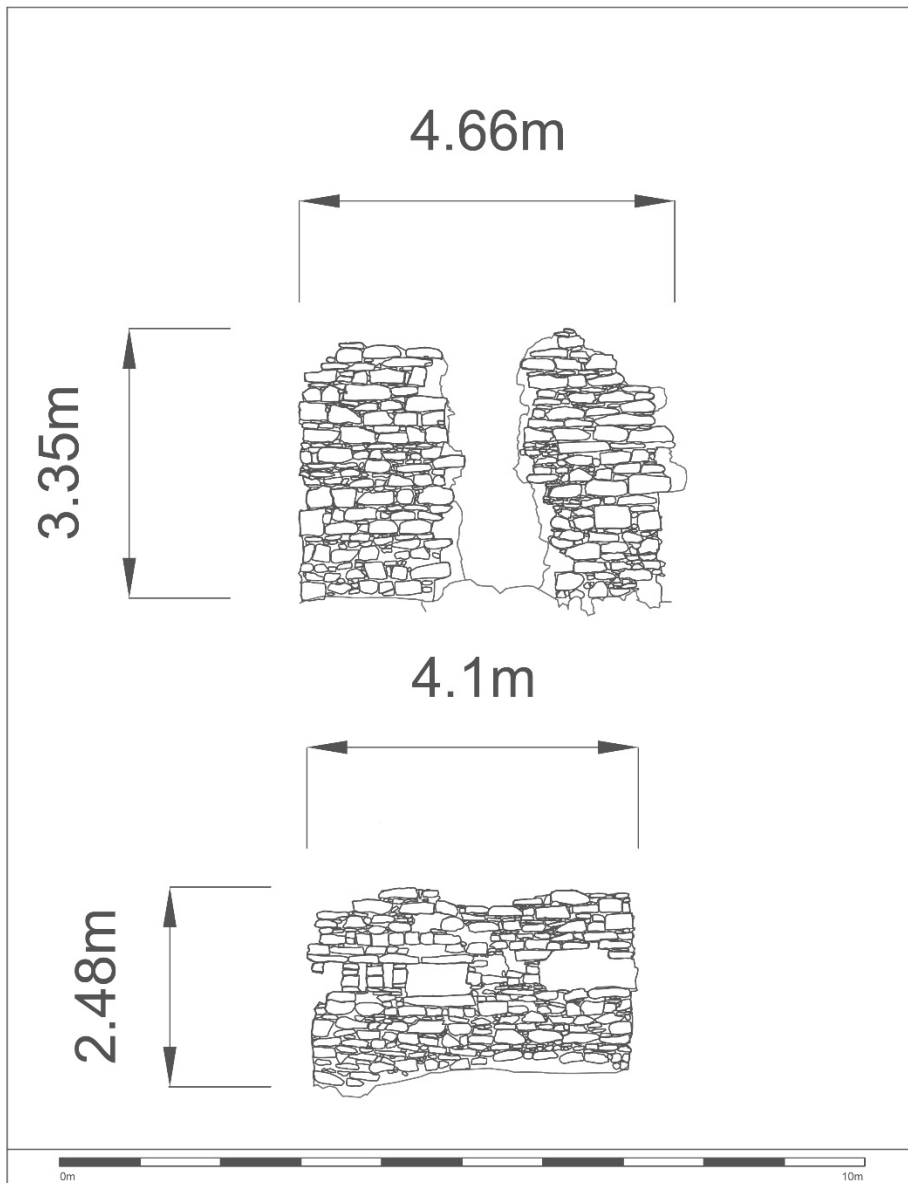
Internal elevations of the north-west (top) and south-west (bottom) walls of the collapsed or unfinished signal tower at Lenadoon Point Signal Station.
